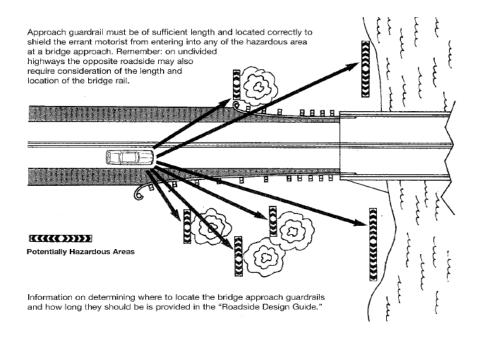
Approach Guardrail Length of Need [FHWA, 1998]
